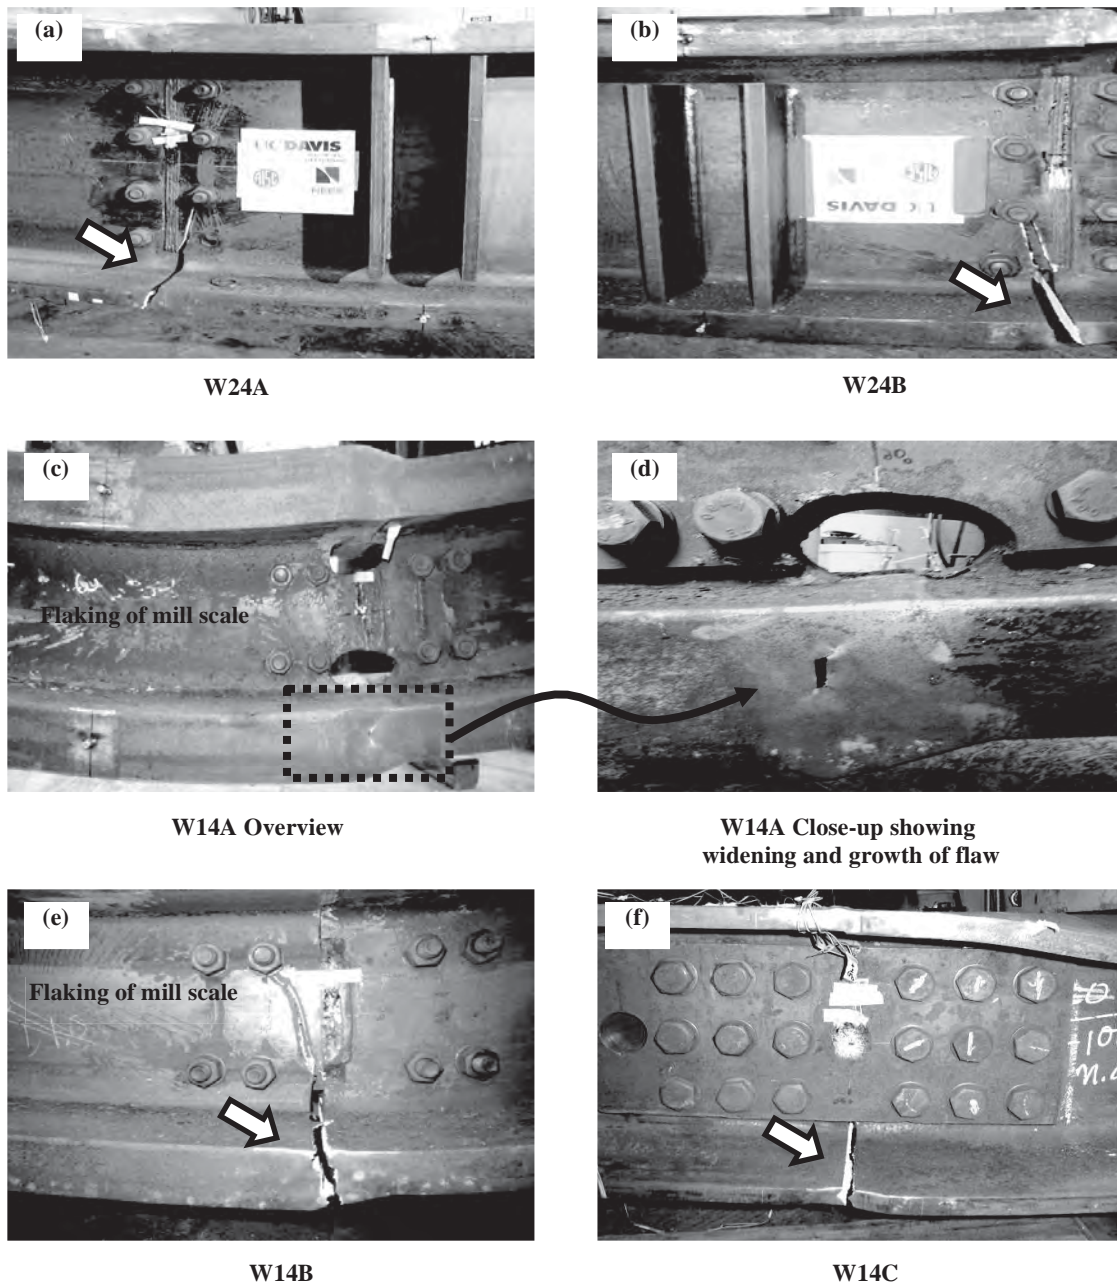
Post-test photographs of all the specimens; block arrows indicate fracture.
